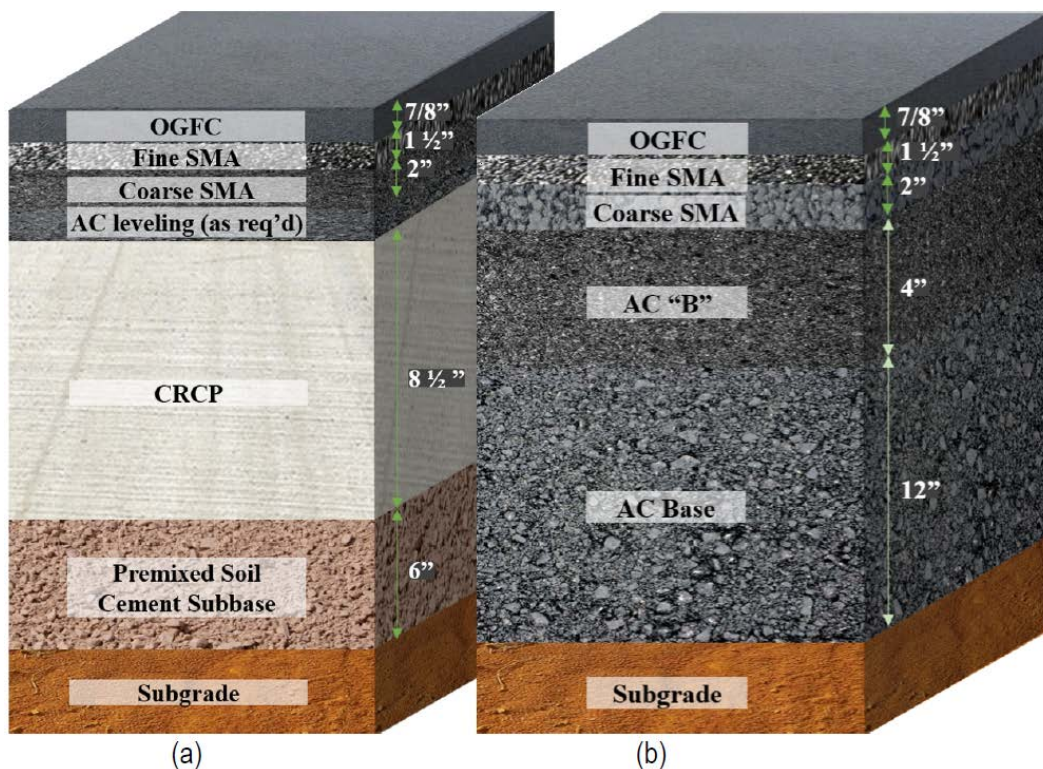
I-95 resurfacing plan over existing CRCP (a) and inner lane widening plan (b).
